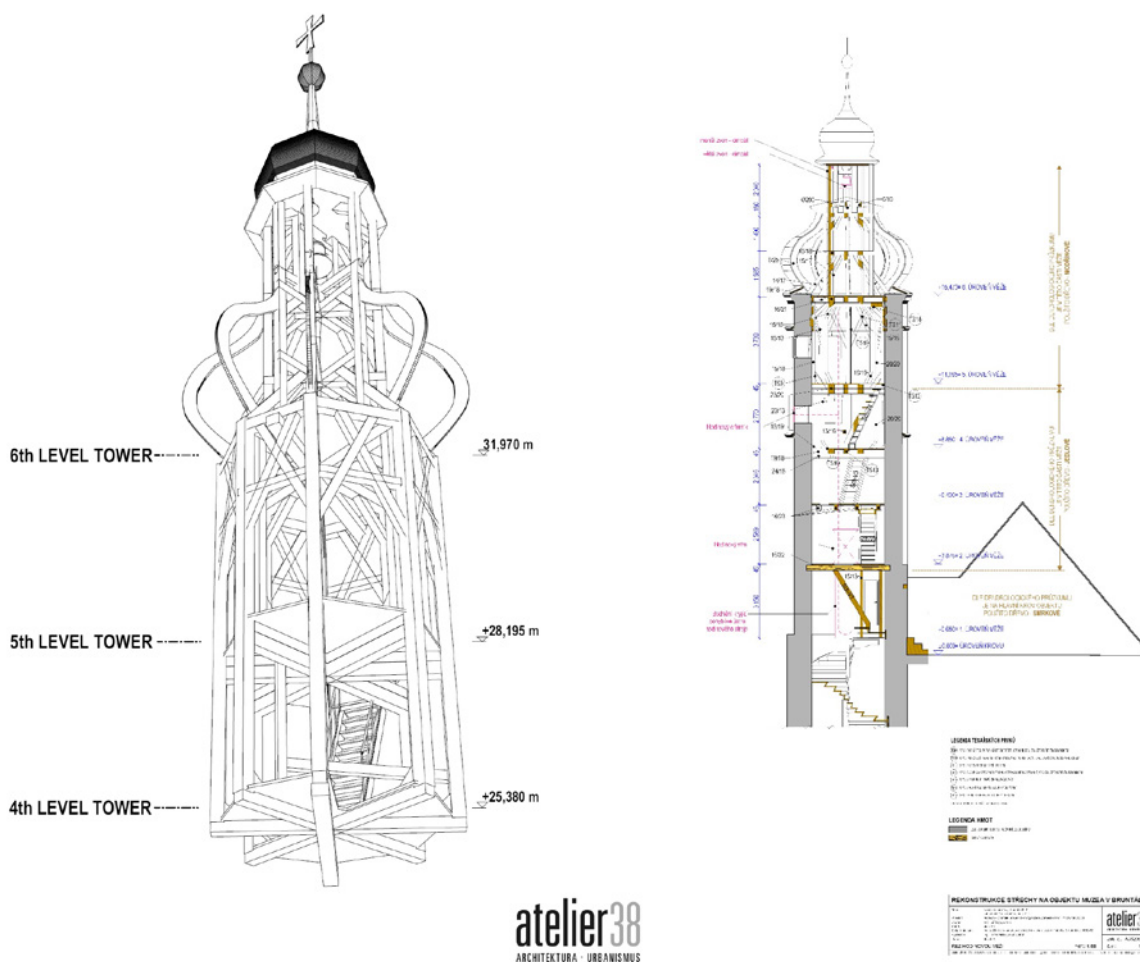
Clock Tower, construction scheme of timber structure. (Drawing, Jakub Sollich, Atelier 38).
